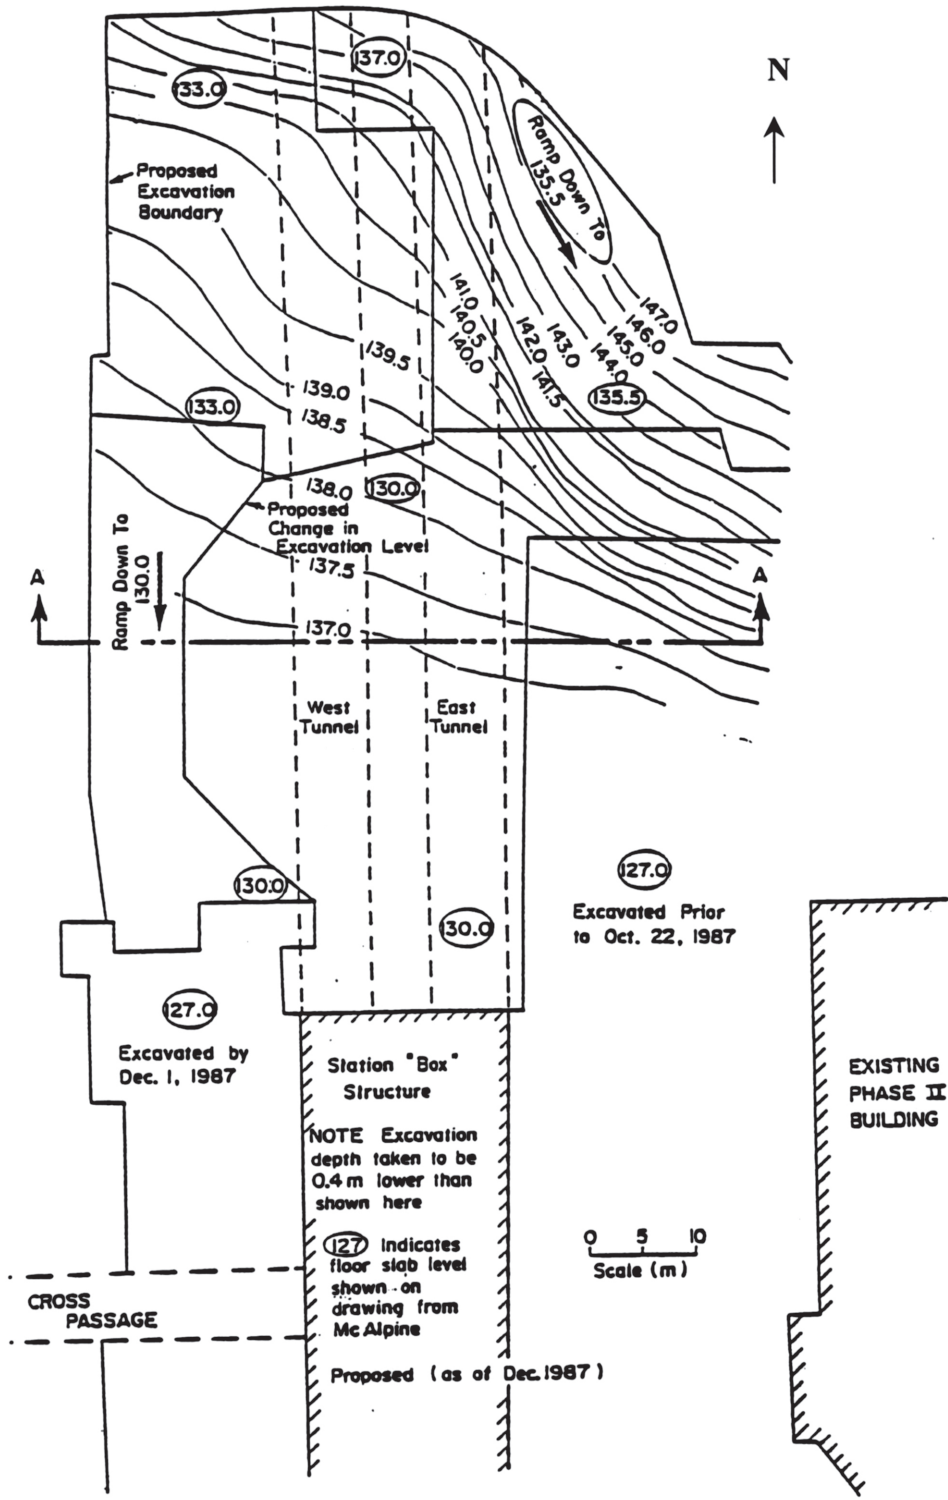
Project layout showing the excavation levels. (Adapted from Lo and Ramsay [1].)
